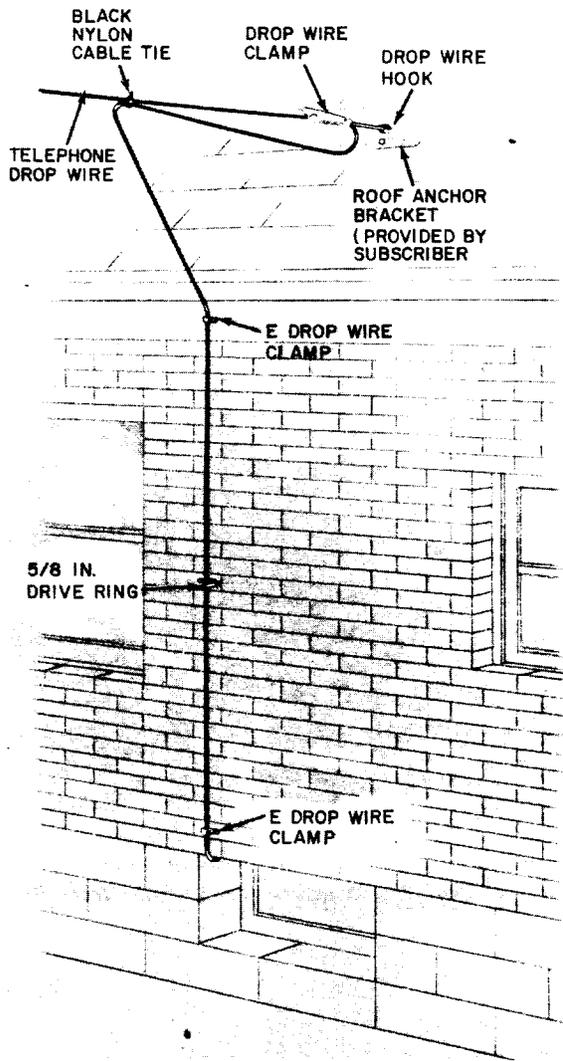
Drop Wire Attached to Roof Anchor Bracket
